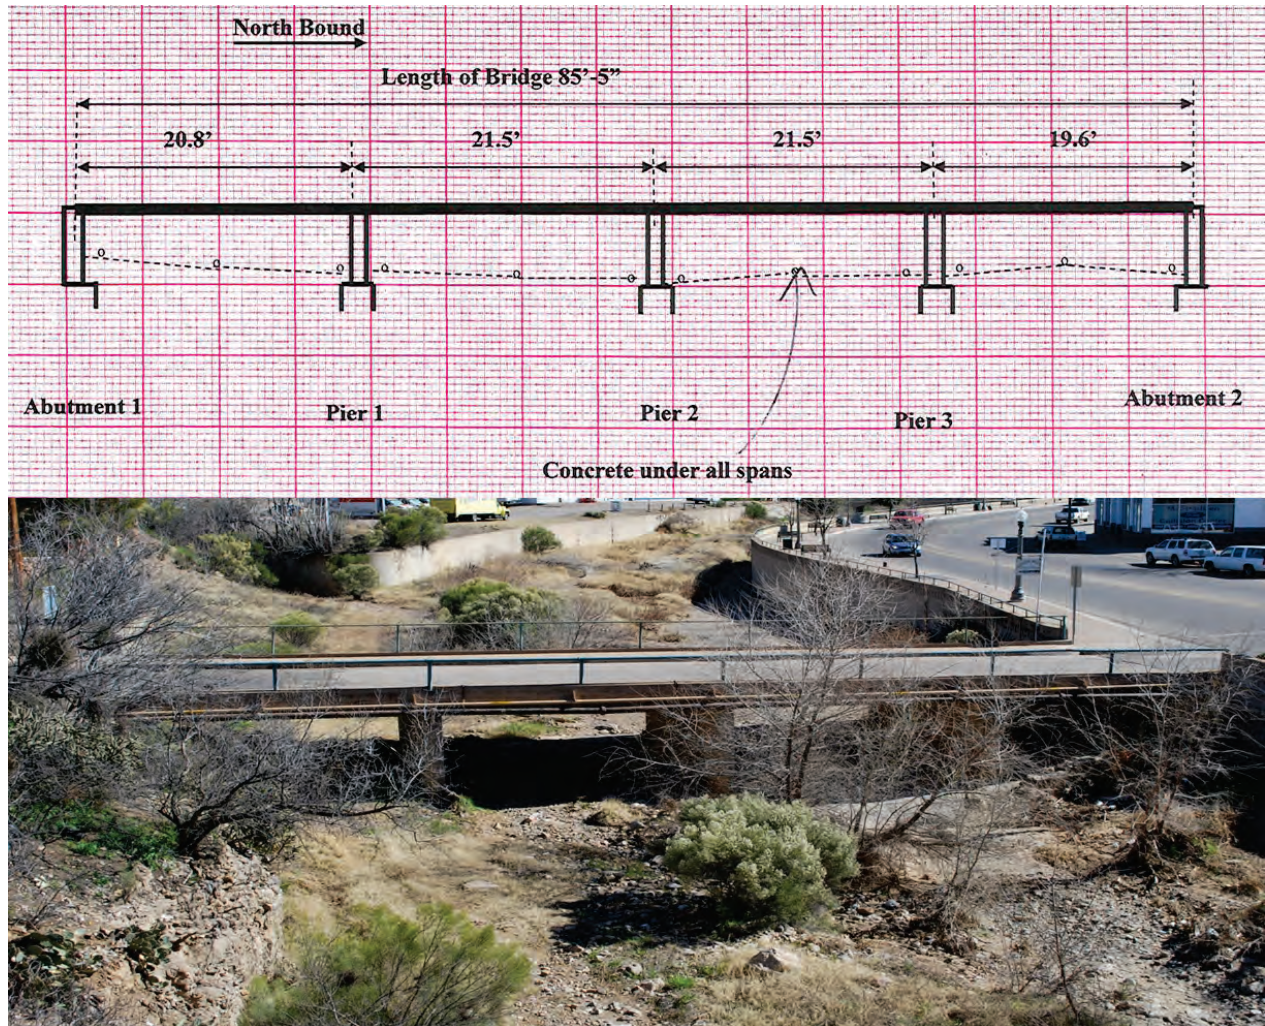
BRIDGE GEOMETRICS (LOOKING SOUTH)
